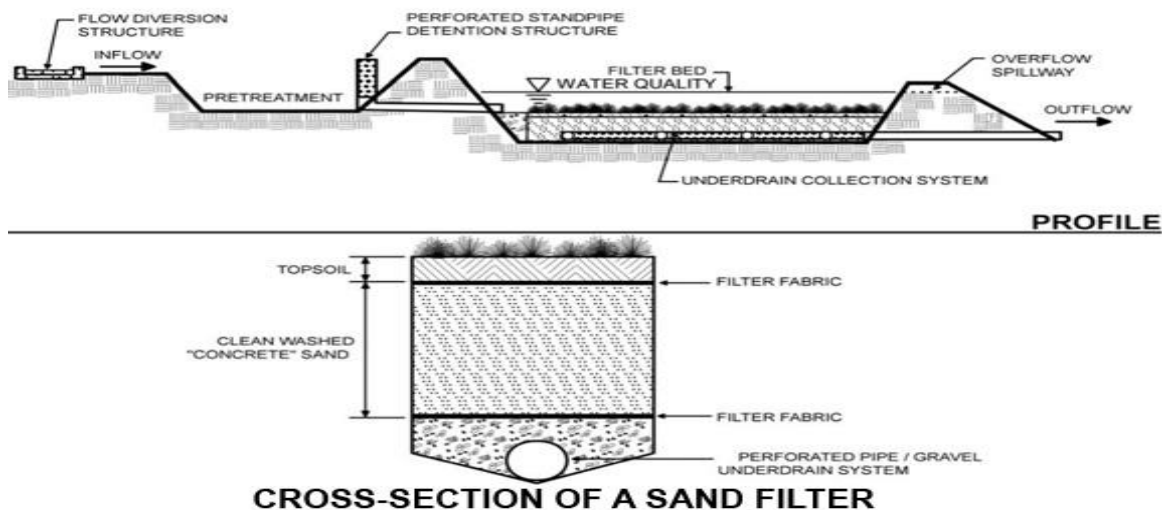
Profile and cross-section view of schematic design of filter system. Source: Structural BMP Specifications for Massachusetts
